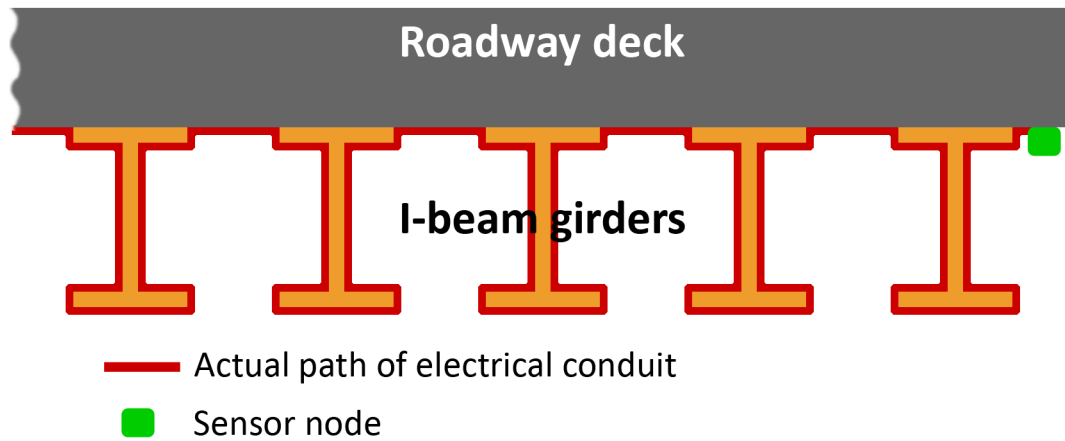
Conduit path to a wired sensor on a typical I-beam-girder bridge
